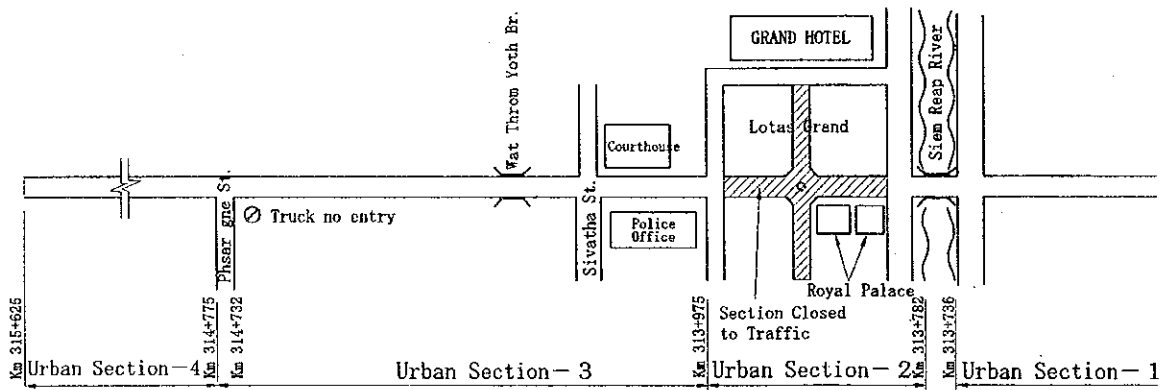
SECTIONING OF URBAN AREA
